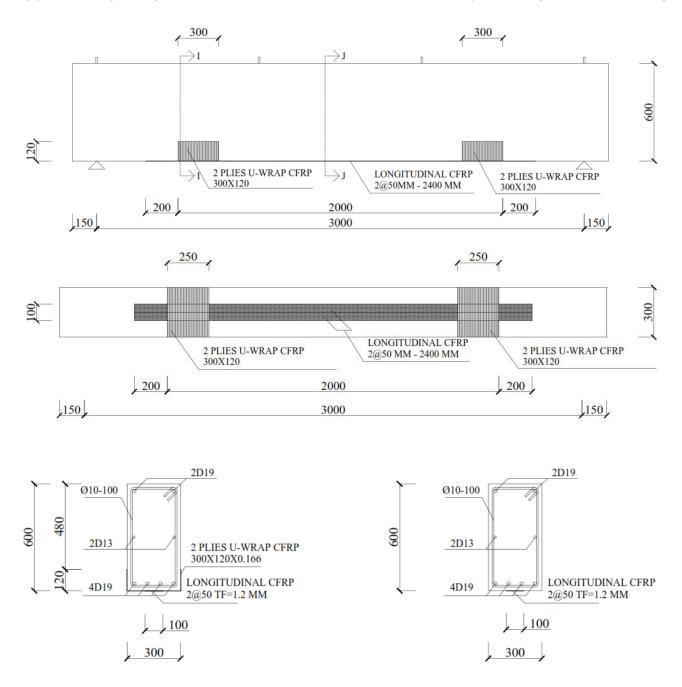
Cross-section of the BU-600 beam; (a) Details of Installation Placement of *Longitudinal* FRP and FRP *U-Wrap*, (b) Detail of Cross-section with FRP *Longitudinal* and FRP *U-Wrap
